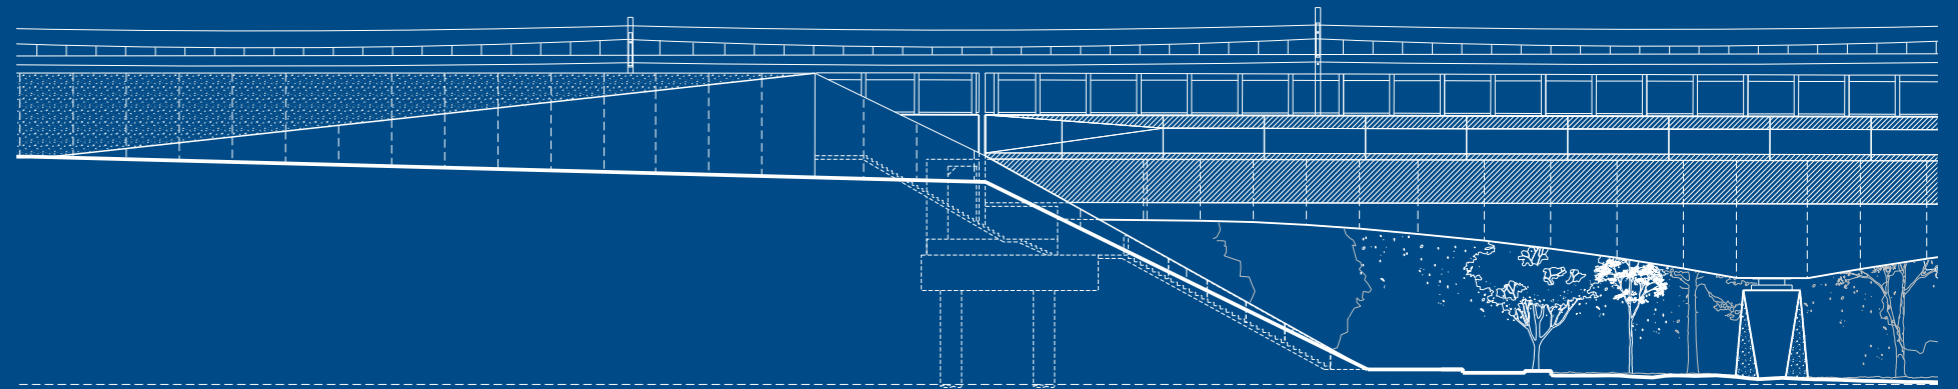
\_ Proposed south elevation - North abutments and approach embankments
